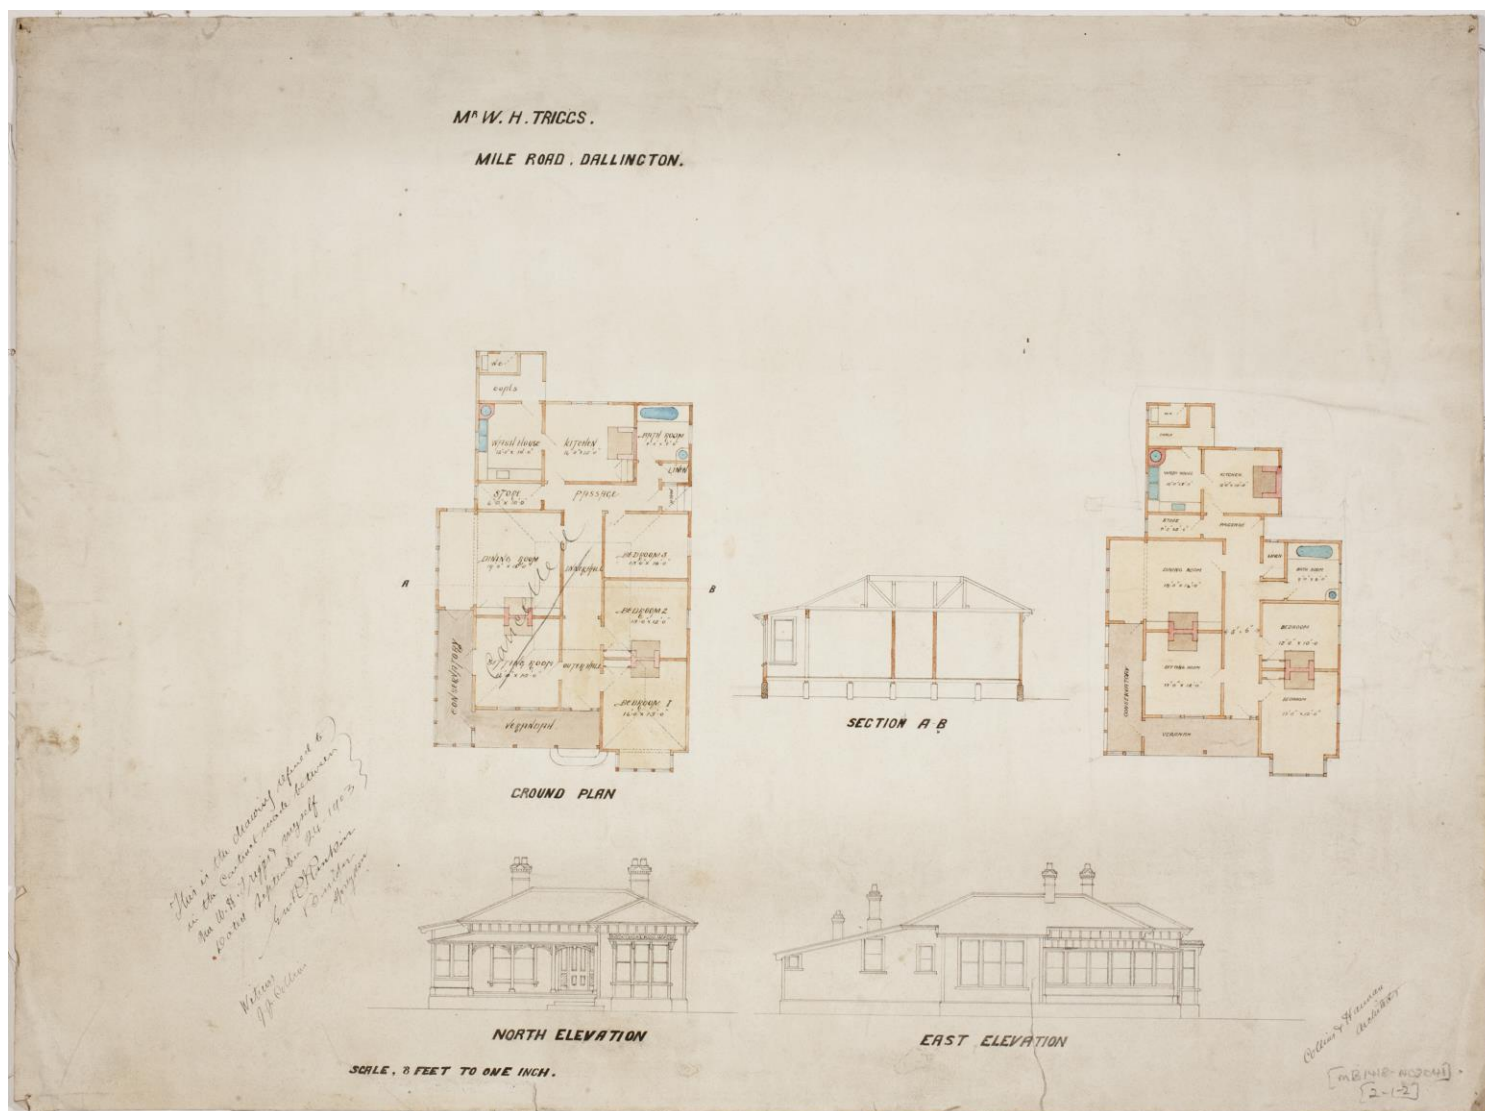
Collins and Harman, Mr W. H. Triggs, Mile Road, Dallington, plans, elevations and section (1903).
